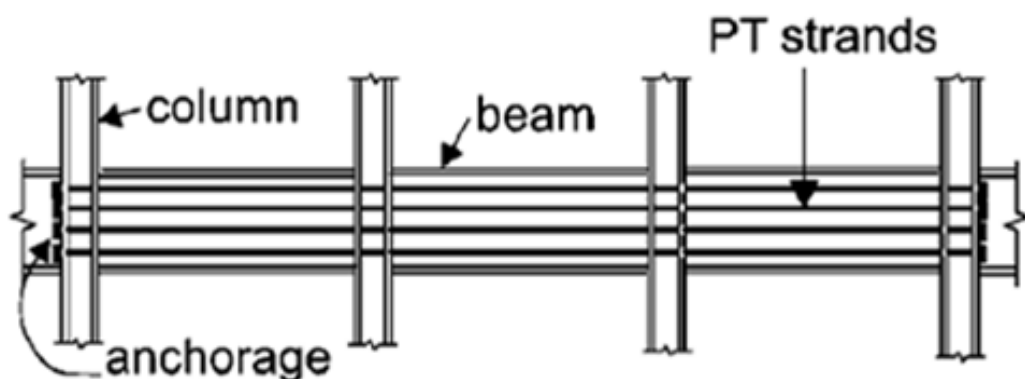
Schematic elevation of one floor of frame with PT friction damped connections (Rojas et al 2005)
